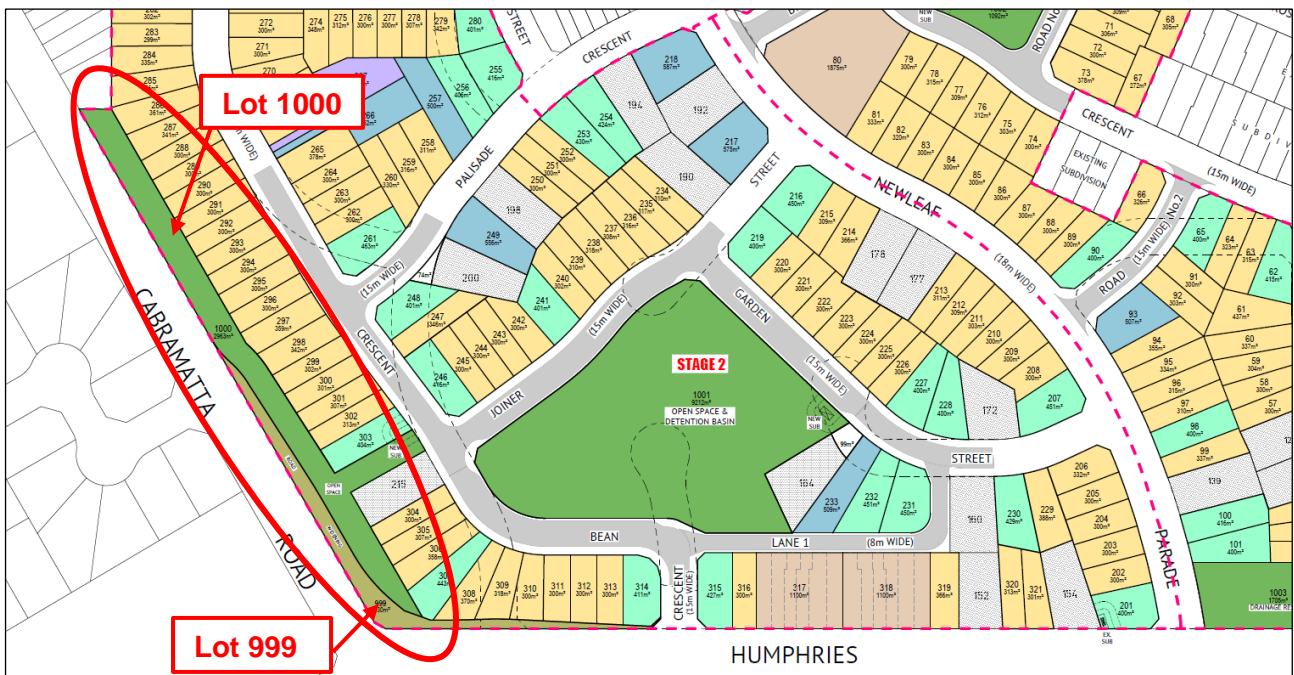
Subdivision Plan, area of road widening circled in red. Premise, 2021.
